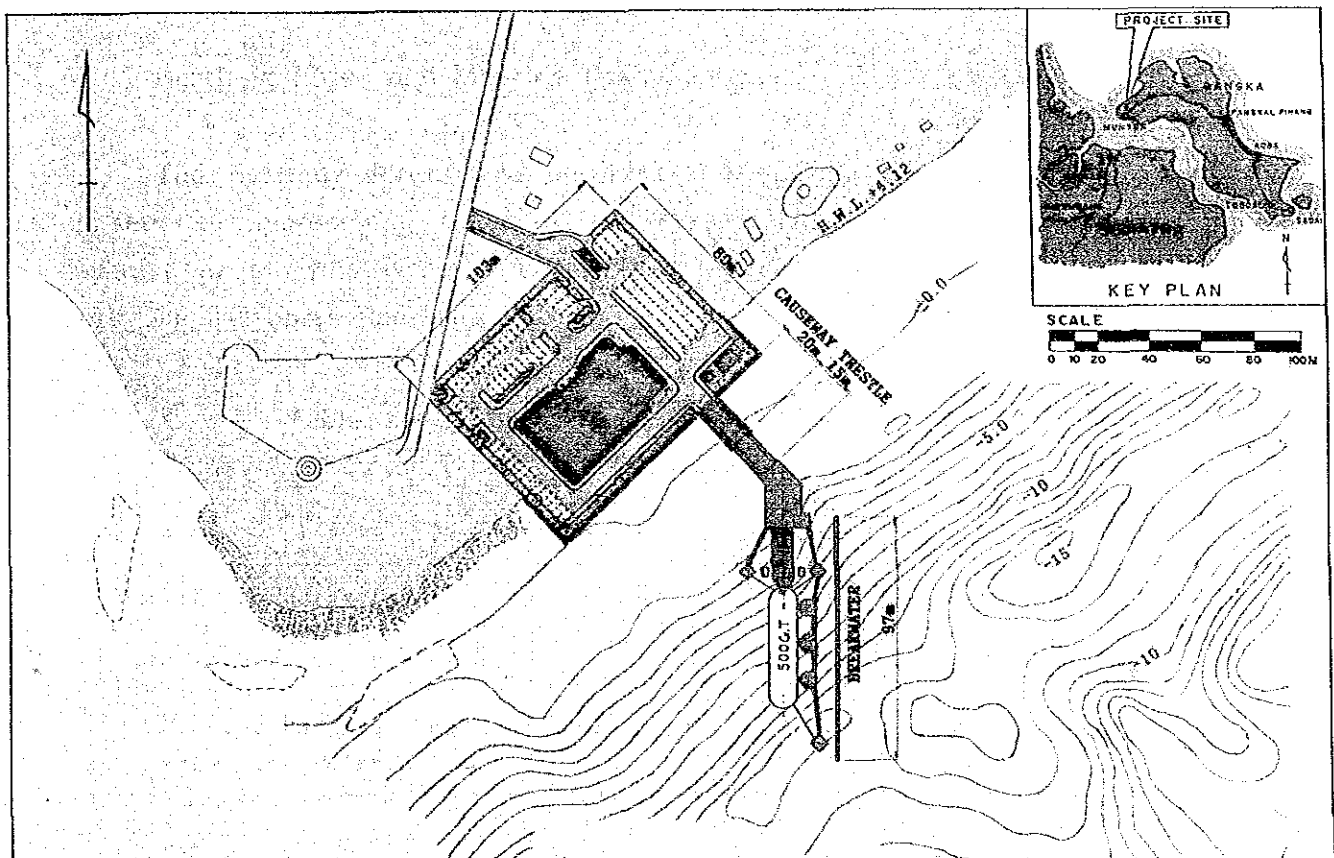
Layout of Muntok Ferry Terminal
